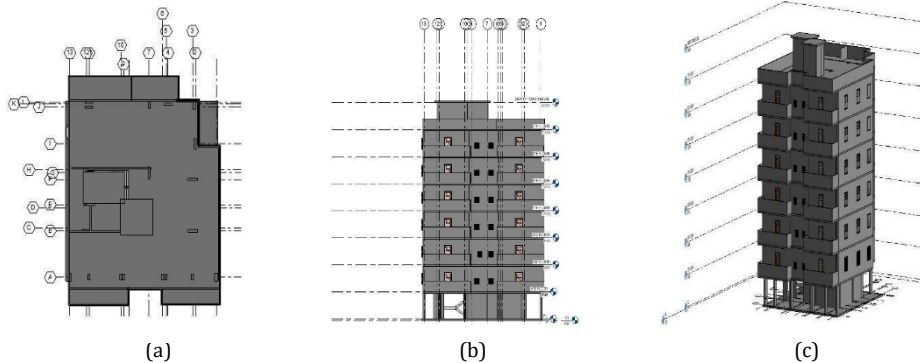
(a) Top View of Building; (b) Elevation of Building; (c) 3D Model of Building.
